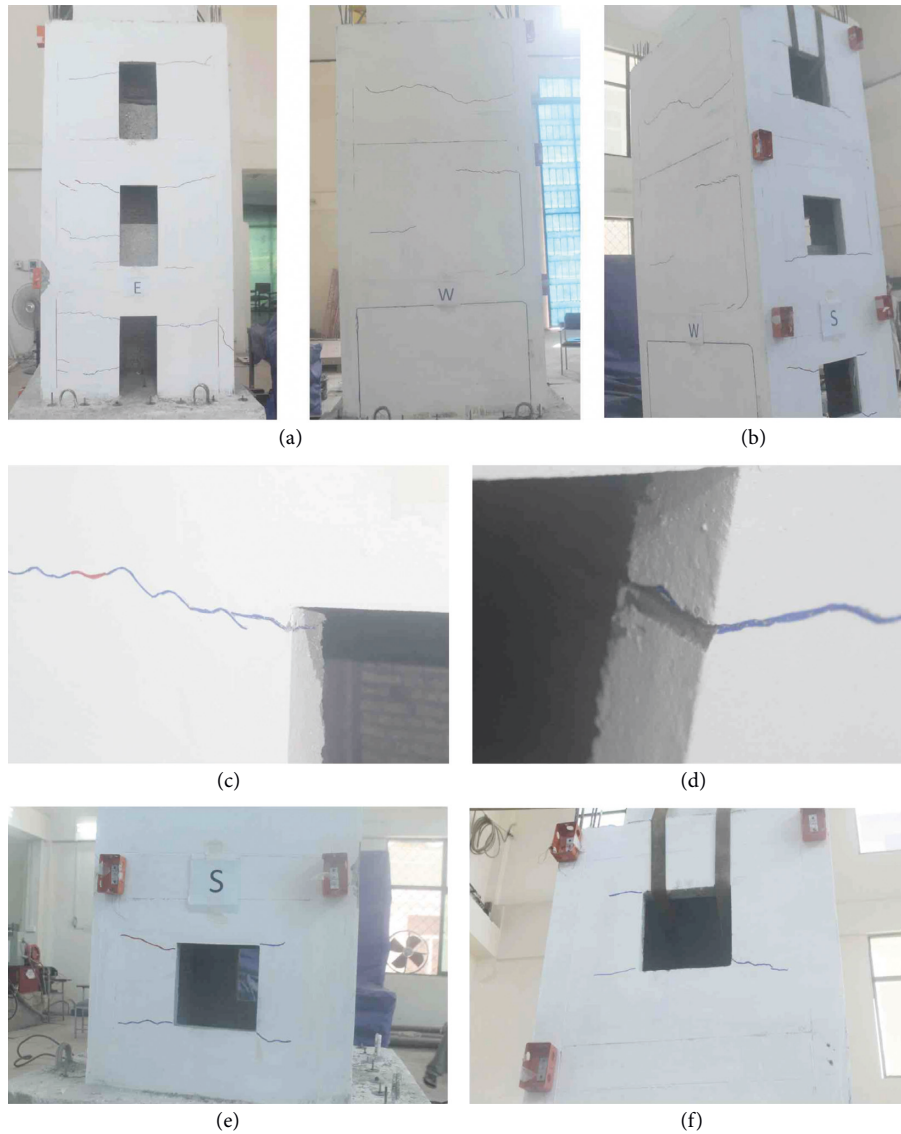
Damages observed in the hybrid masonry-infilled frame structure under 200% earthquake motions. (a) In-plane loaded frame. (b) Face-loaded frame. (c) Through horizontal cracks in masonry panel. (d) Horizontal sliding at the masonry bed joint. (e) Damage to out-of-plane panel on ground story. (f) Damage to out-of-plane panel on third story.
